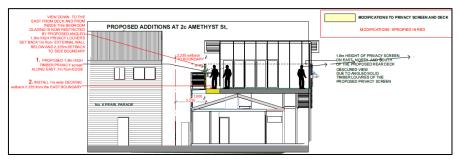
Demonstrates overlooking is reduced to adjoining property, No. 6 Pearl Parade, by the proposed privacy screening on the reinstated narrower deck
